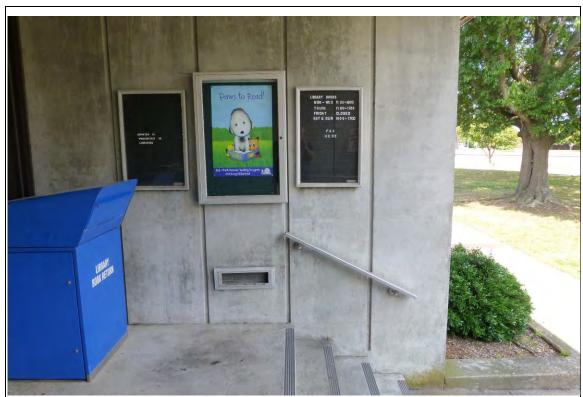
Building 1313, poured-in-place concrete wall of the recessed entry on the north elevation (ERDC-CERL, 2014).
